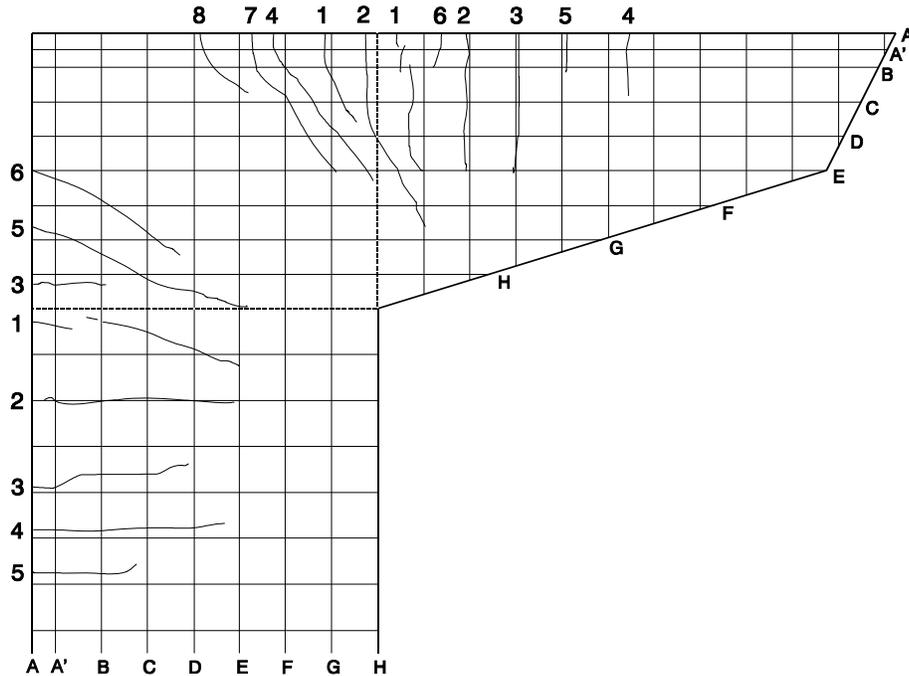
POJ-RC-100 cracking pattern on north face of specimen at dead load
